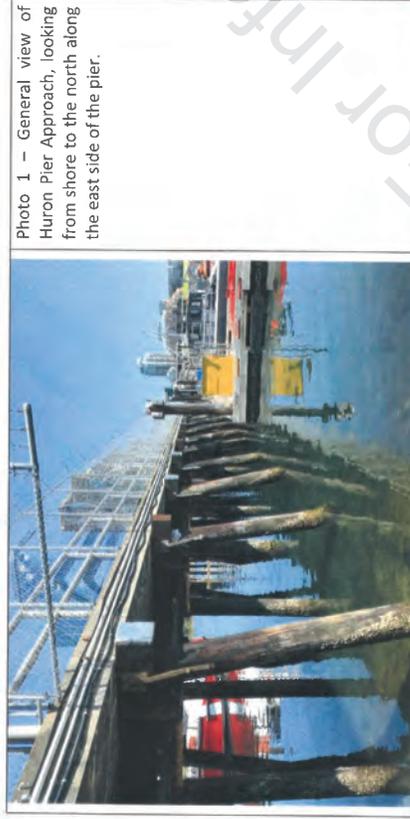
General view of Huron Pier Approach, looking from shore to the north along the east side of the pier.
